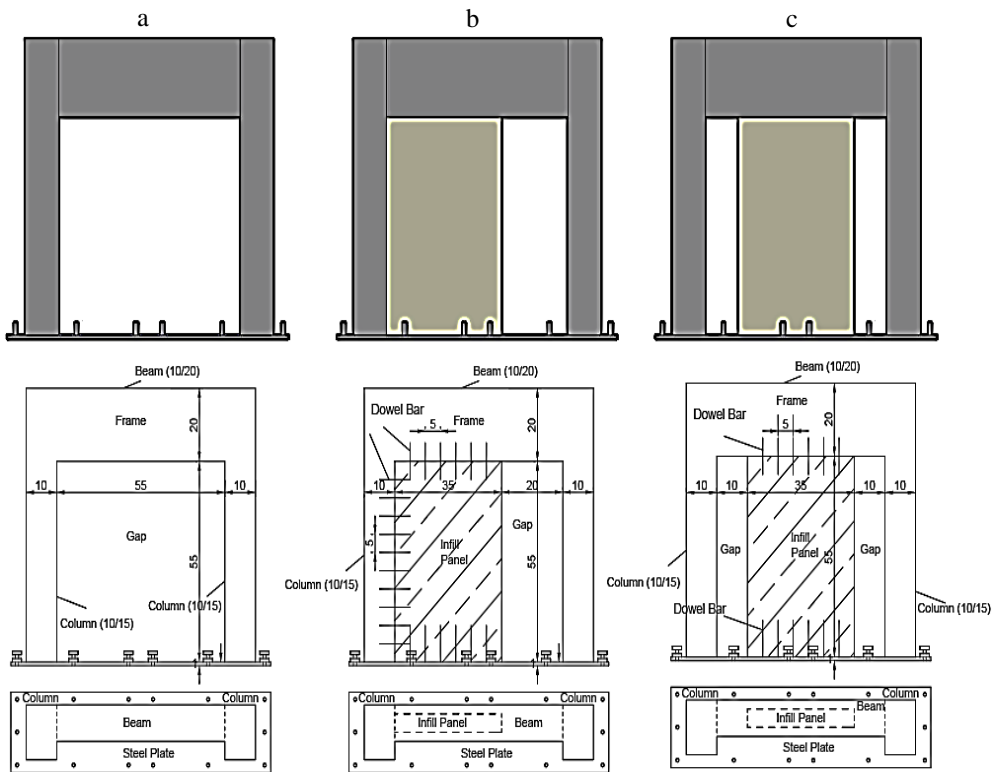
a) Reference specimen b) Specimen 1 (Spc 1) c) Specimen 2 (Spc 2)
